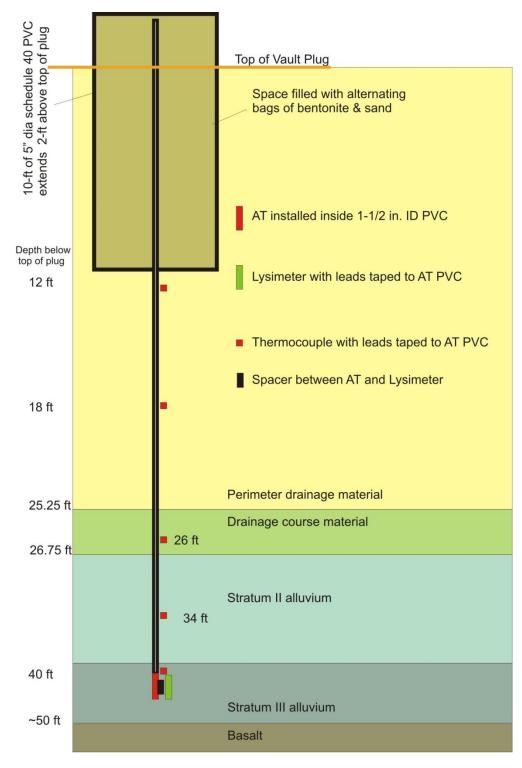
Vertical section showing instrument locations in the 55-Ton-South-45 drilled borehole. Note there is one AT and no WCR.
